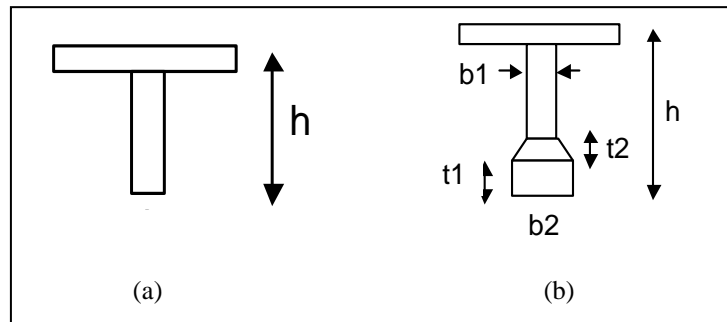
Cross-sectional shape – (a) T-beam section; (b) Bulb shape beam section
